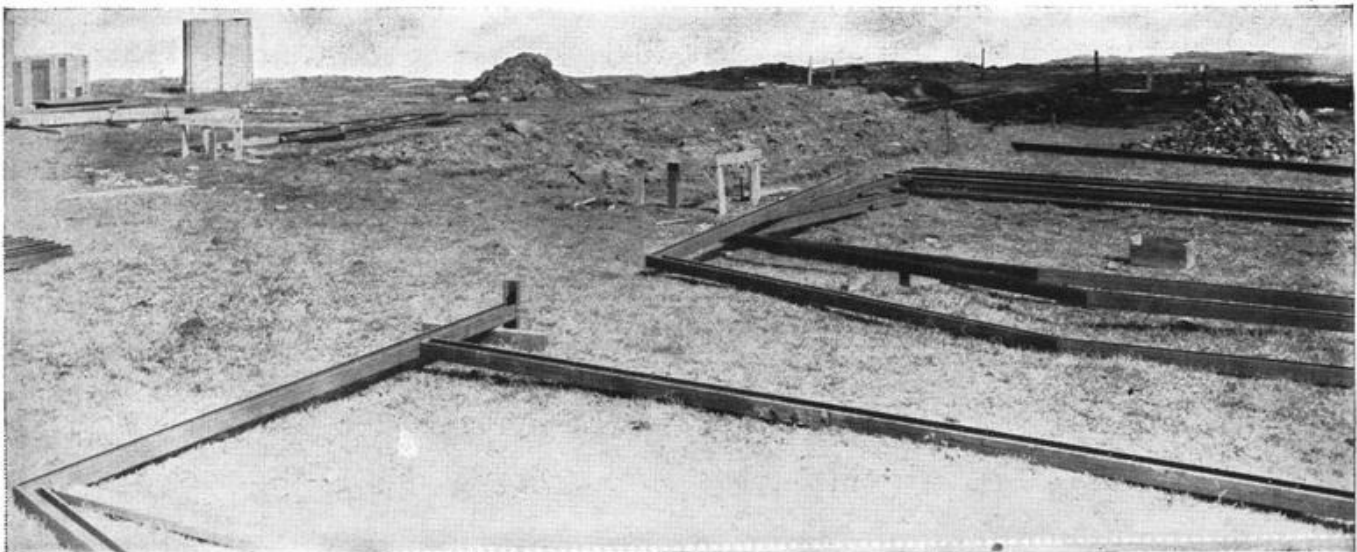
View showing site with trenches dug and rib material ready for assembly.
